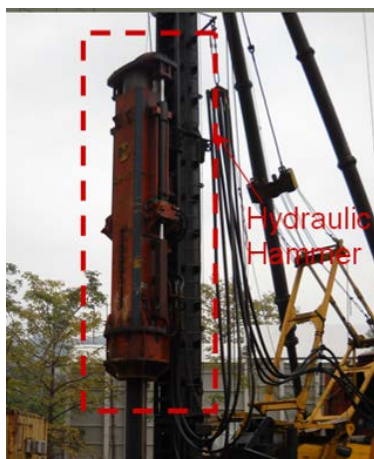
Pitching of Pile (by Hydraulic Hammer)
